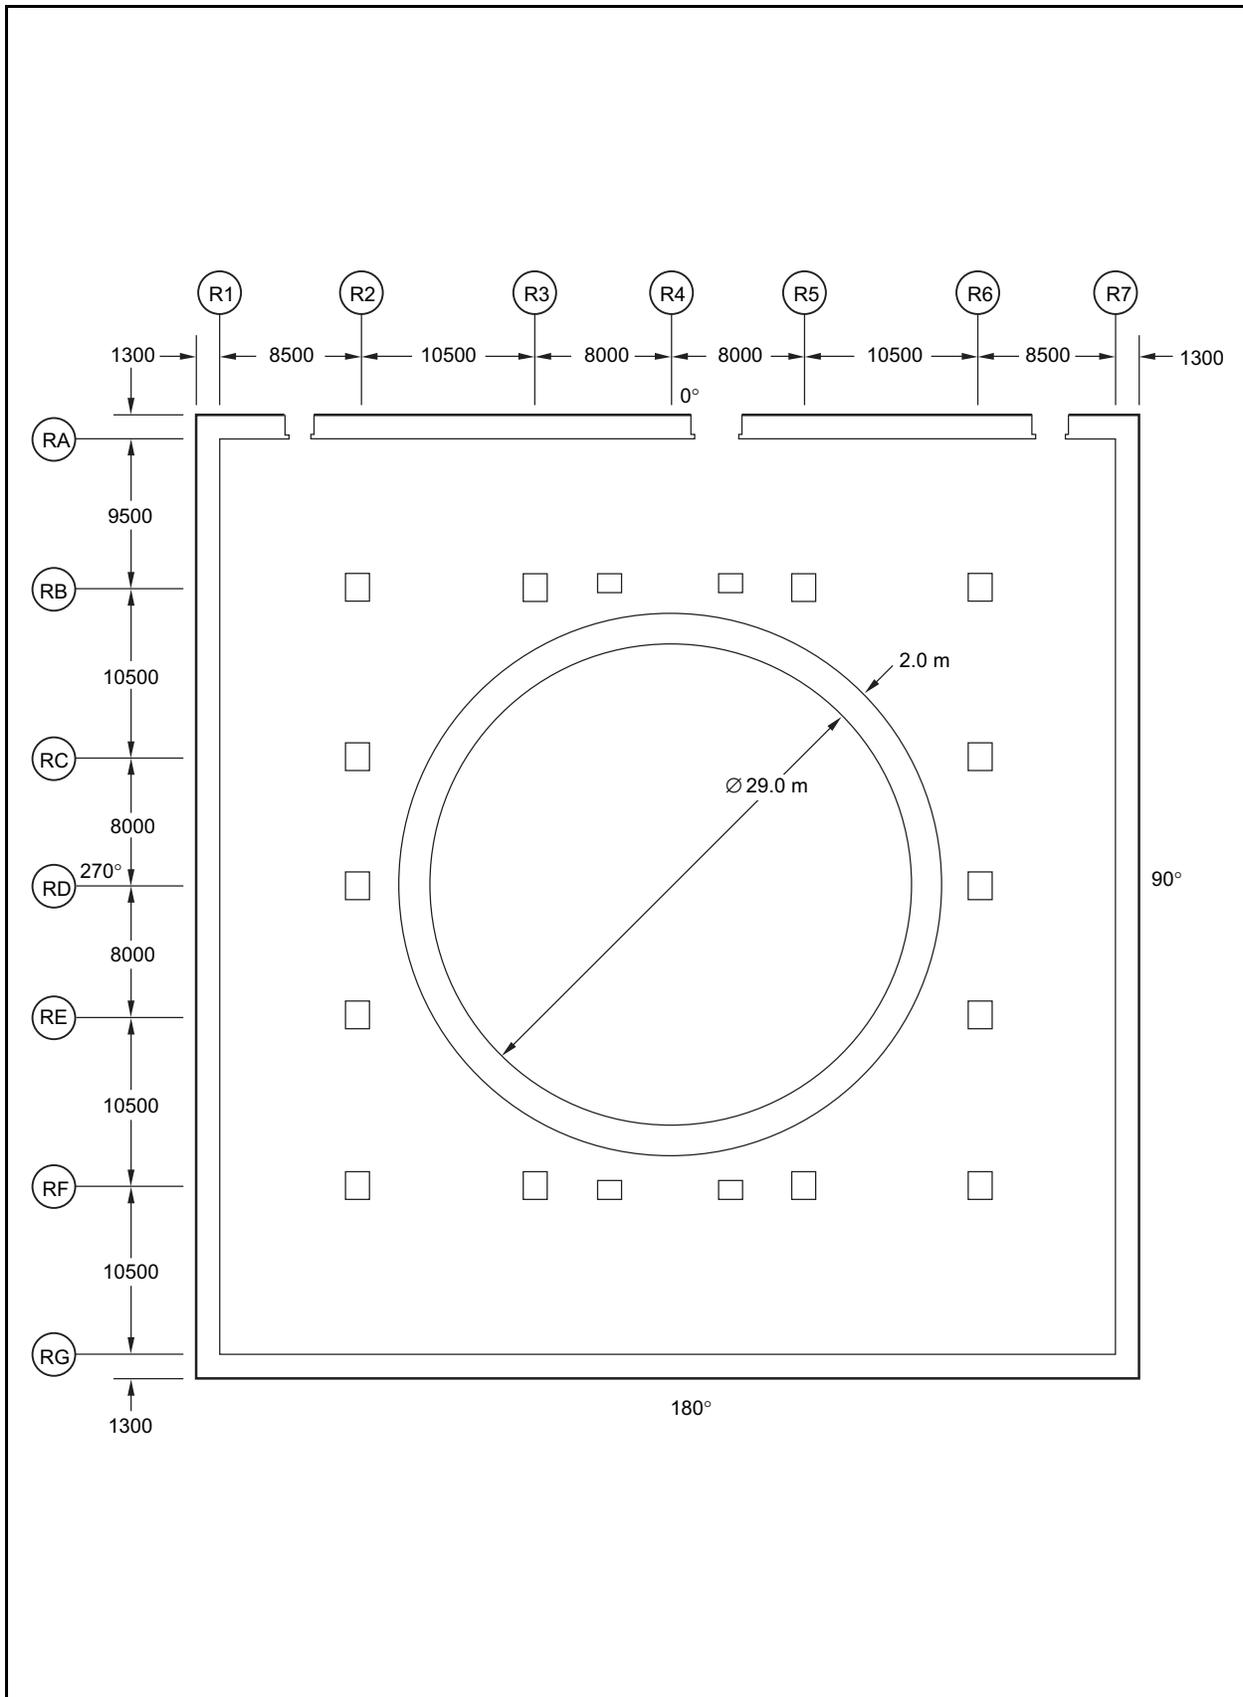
Reactor Building Arrangement Floor B1F Elevation 4800 mm
